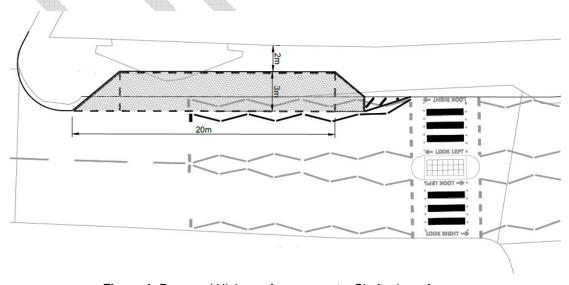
Proposed Highway Arrangement – Shaftesbury Avenue
